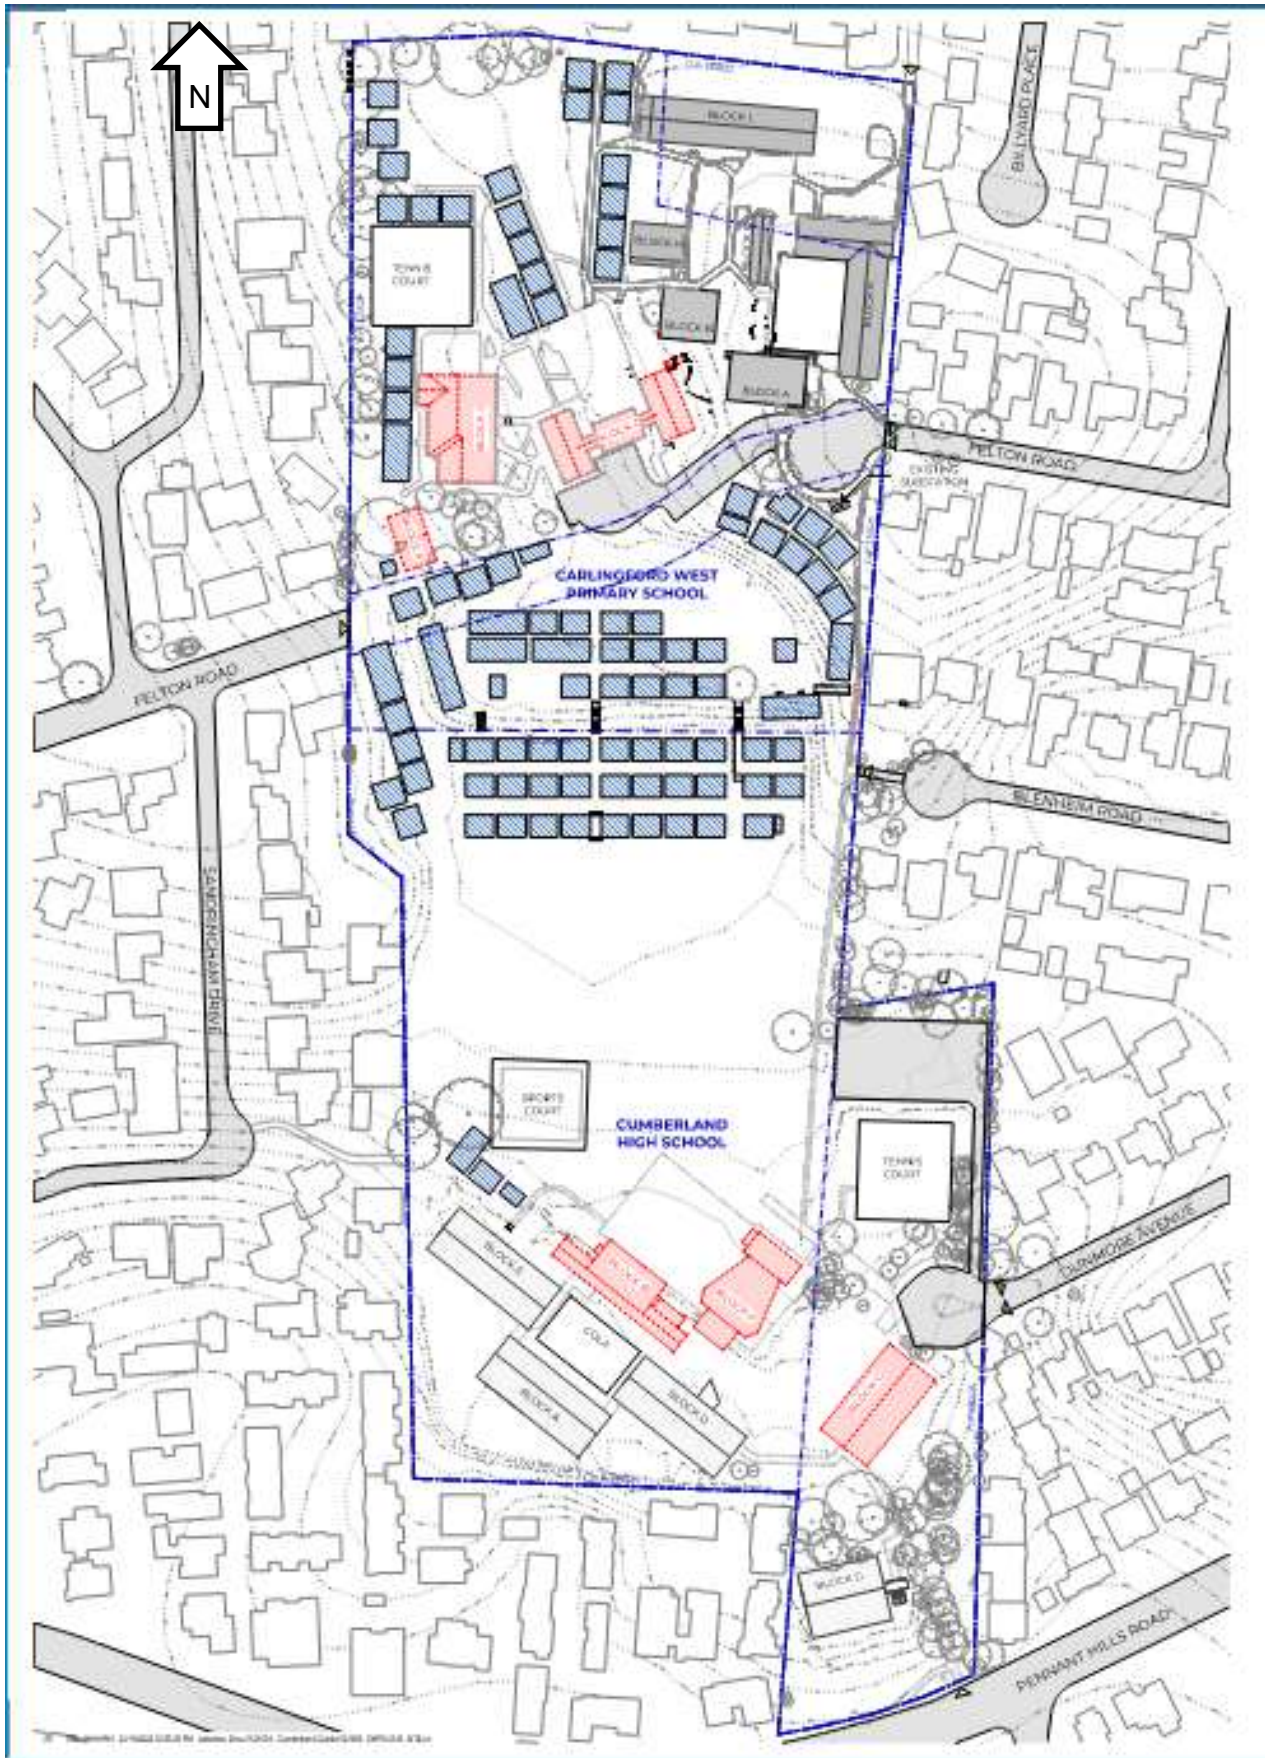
Woods Bagot SSSA site plan existing CC-WB-DA-10-00-05
